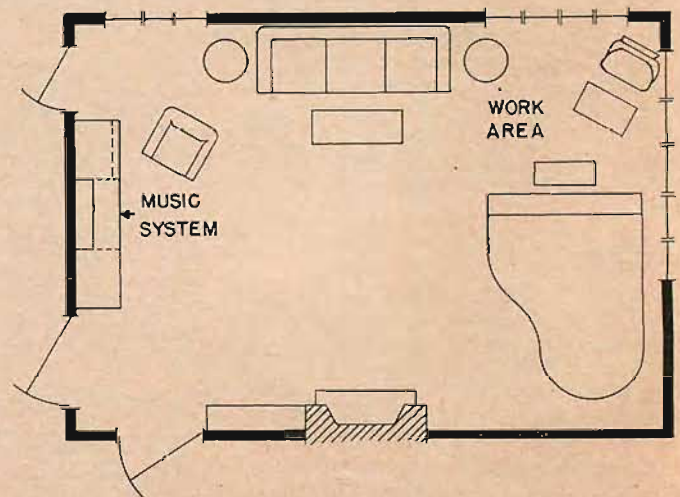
Floor plan of Mr. Taylor's apartment. Note furniture arrangement in relation to site for the music system on left wall of room. Work area is on right of room where piano is placed.
